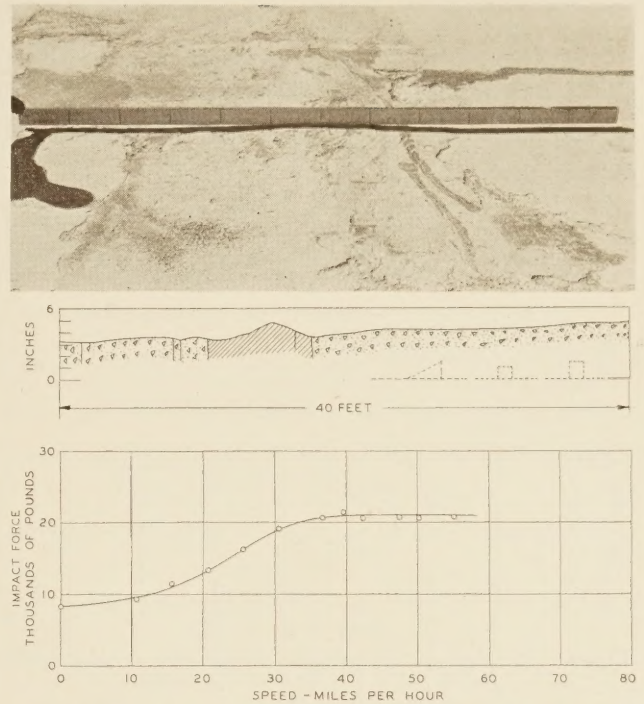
IMPACT REACTIONS PRODUCED AT A ROUGH BITUMINOUS PATCH ON A CONCRETE PAVEMENT
